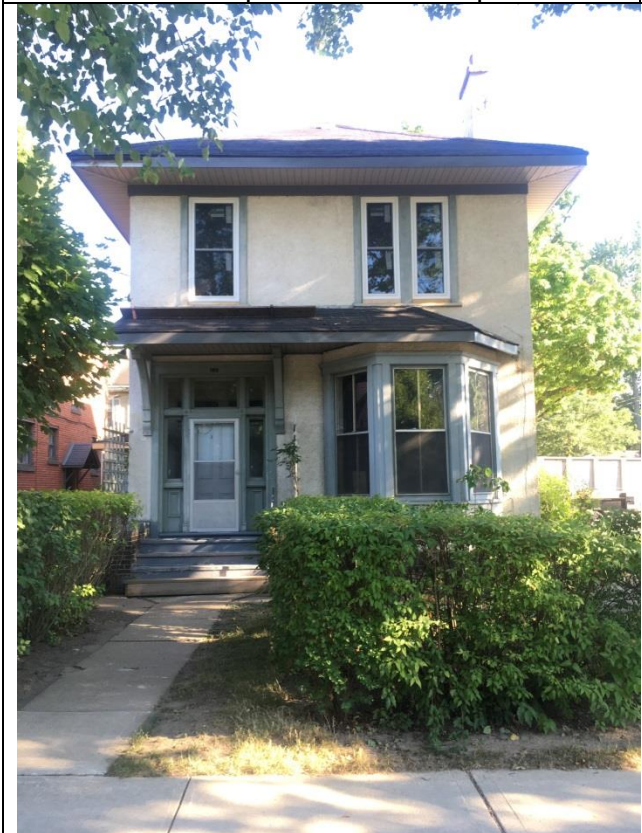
Front façade (north) of building at 183 Bruce Street after window replacement (August 10, 2016).
